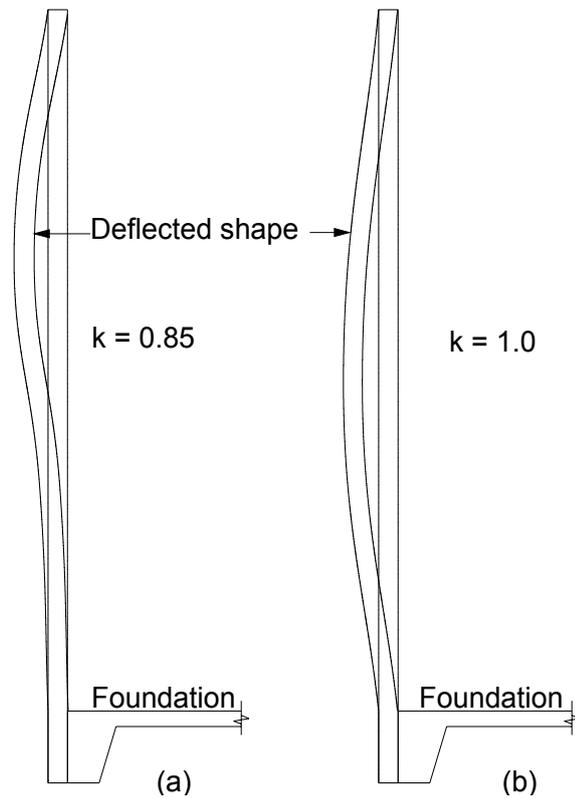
Out-of-plane deflected shapes of slender walls (NDPR case)
